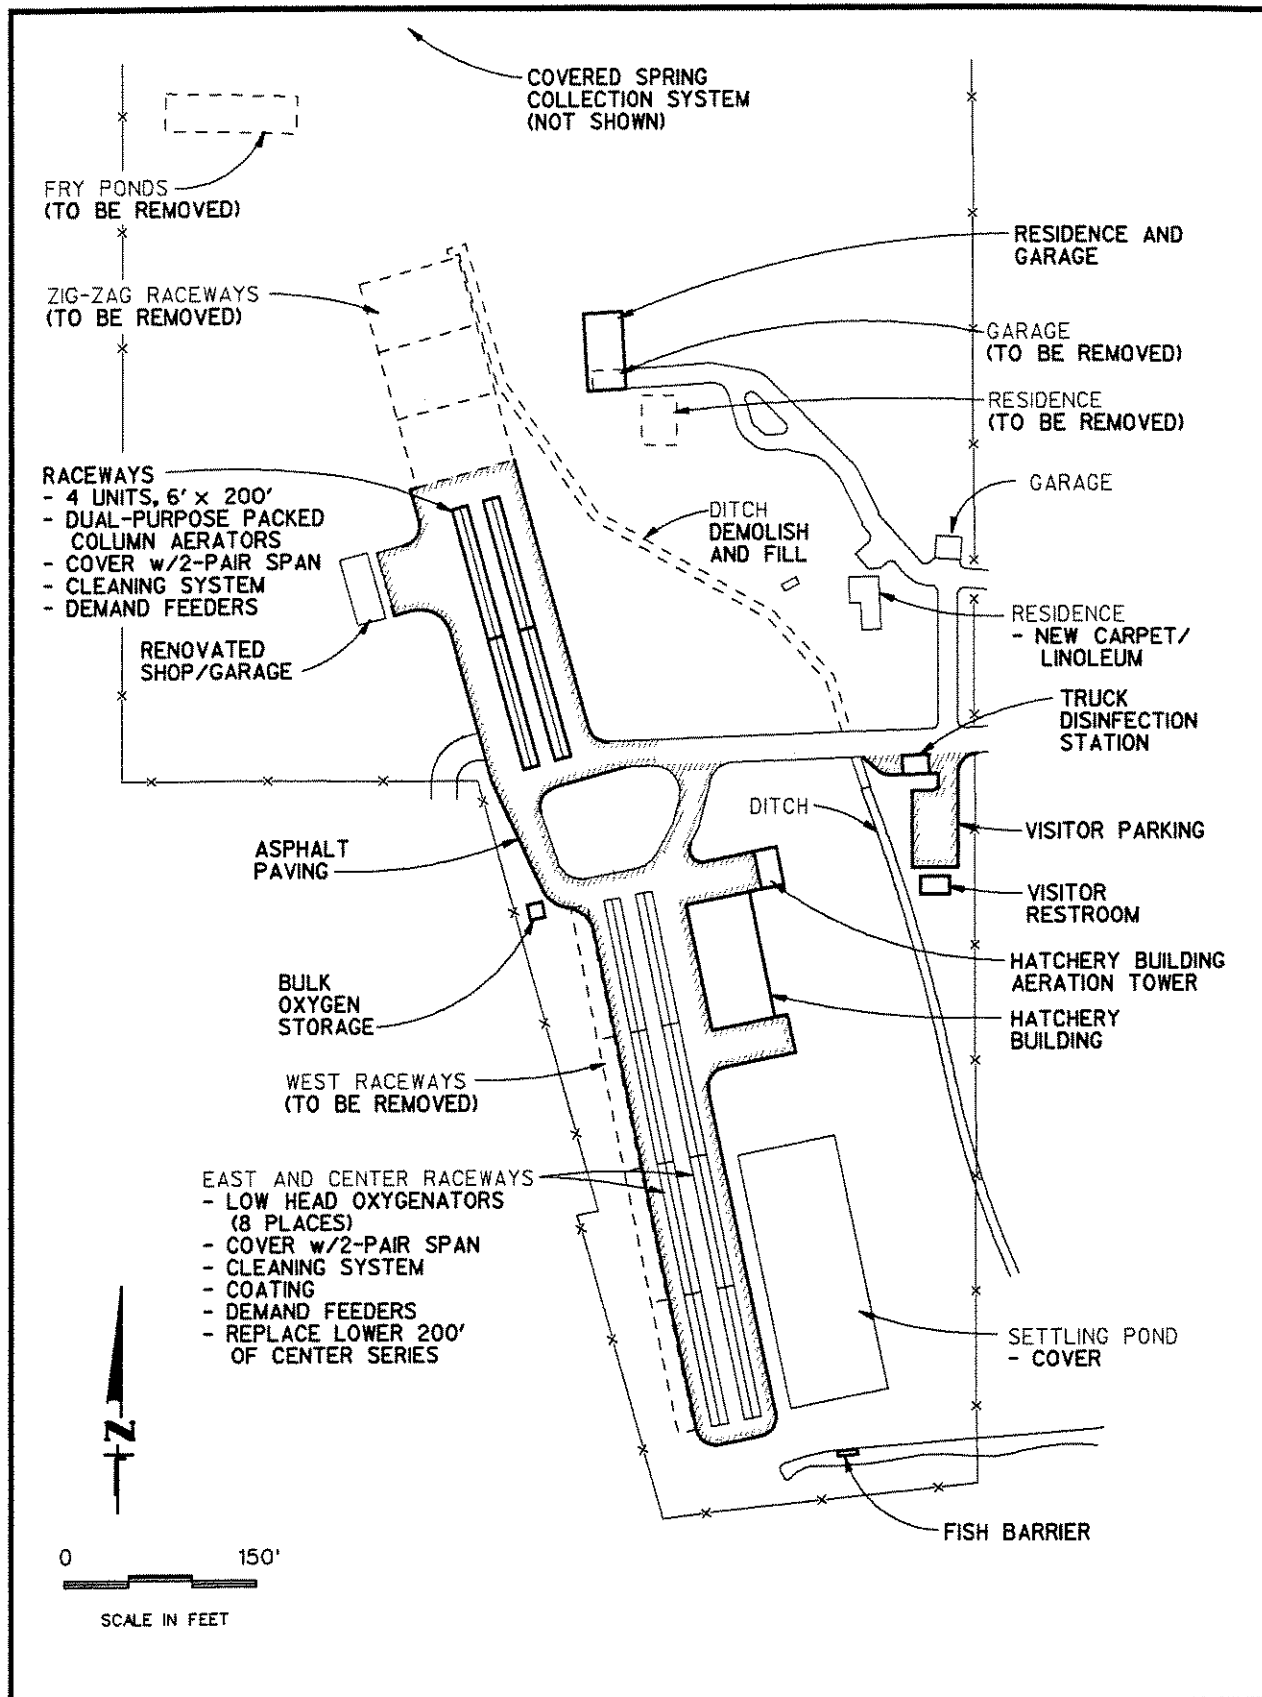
Whiterocks Hatchery Enhancement Plan
